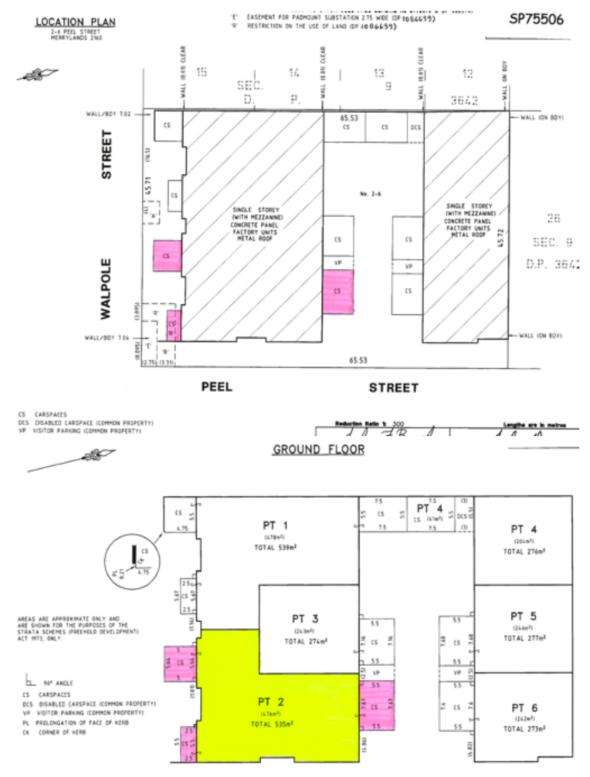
Extracts from Strata Plan with existing car parking spaces indicated
